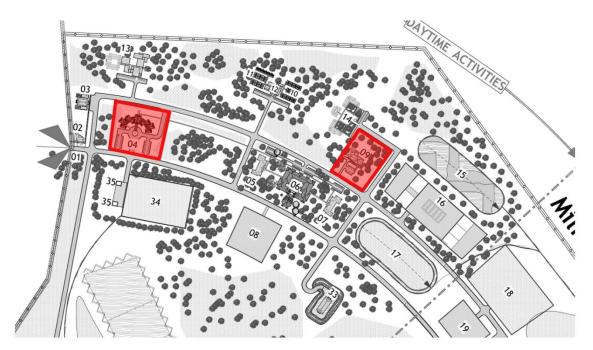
Site Masterplan showing B04, B09 and the Northern Spine road running between the 2 No buildings.
